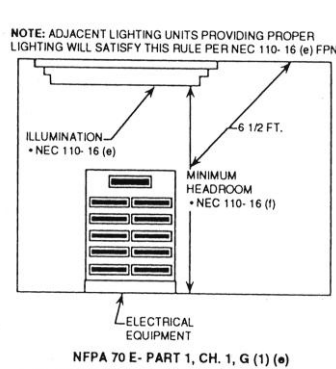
Proper lighting shall be provided for the servicing of electrical equipment.
